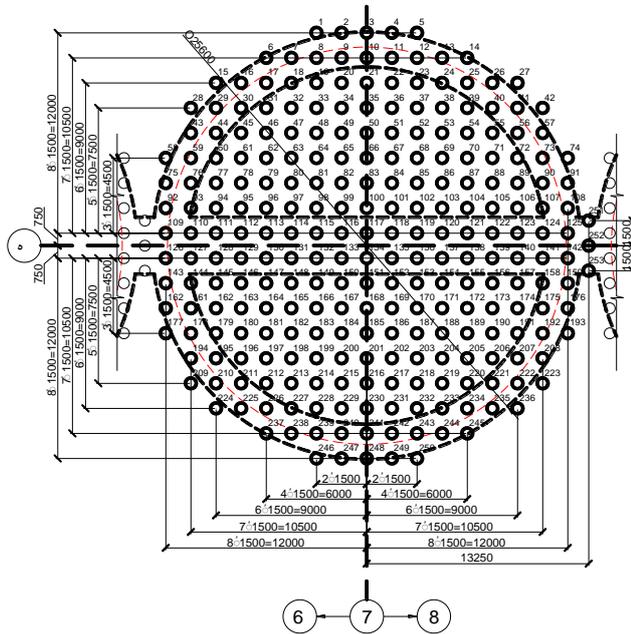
A layout of reinforced soil-cement piles positioning underneath the vertical steel oil tank
